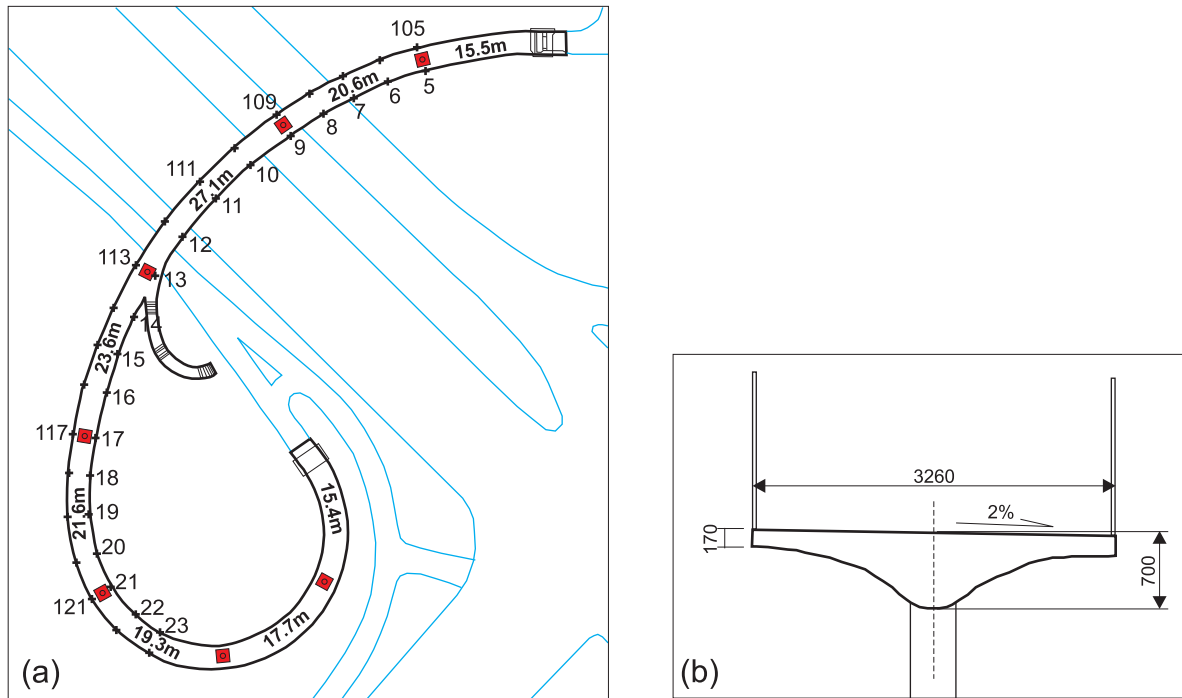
RCF: (a) plan view including test point numbers and (b) cross section (not to scale).
